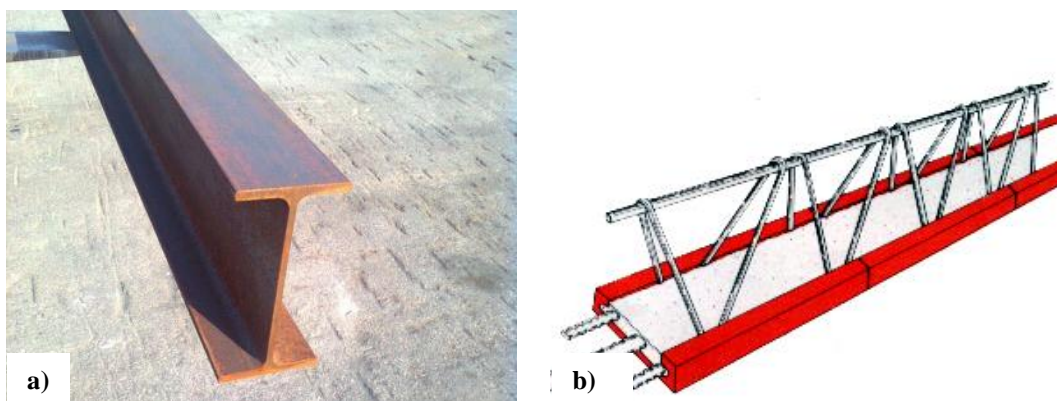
Examples of horizontal elevation structure: a) Steel beam; b) Joist.
